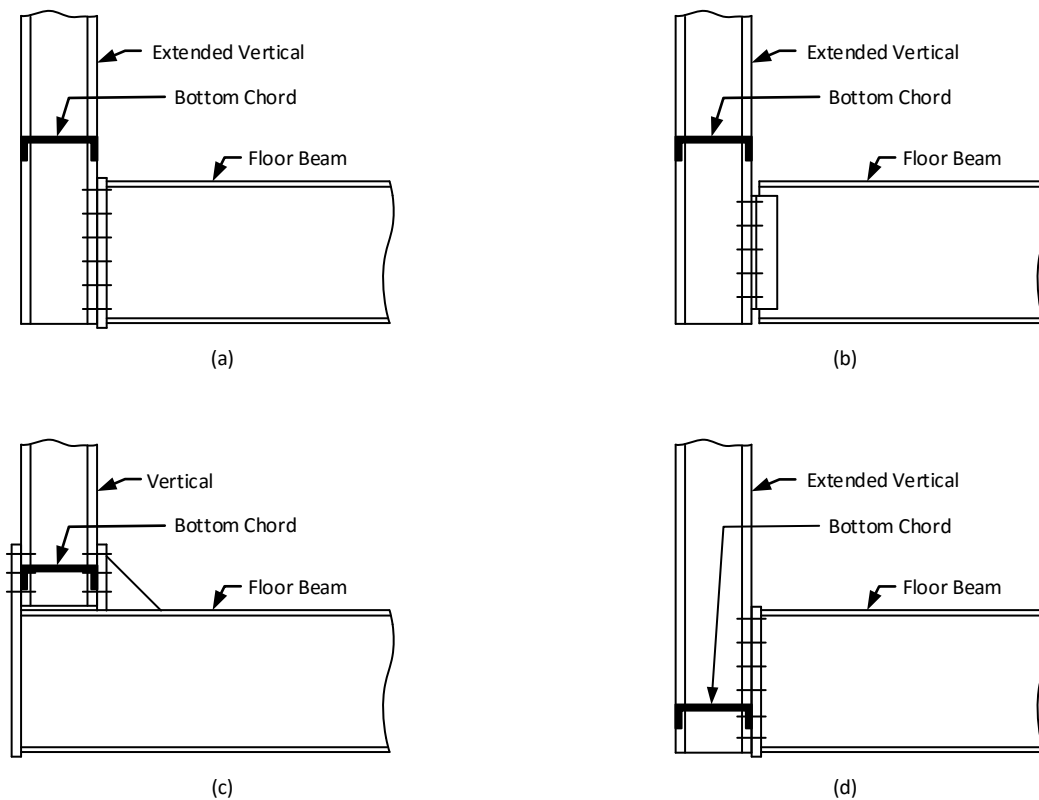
Common Details for End Connections of Floor Beams in PTBs
